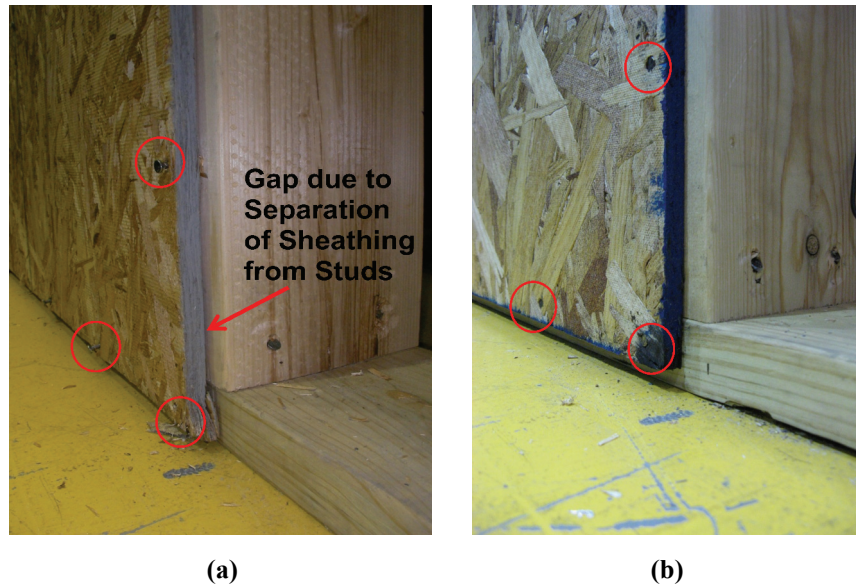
Wall Damage in East Wall after Level 5 (40%) Test: (a) Conventional Wall and b) Retrofitted Wall
